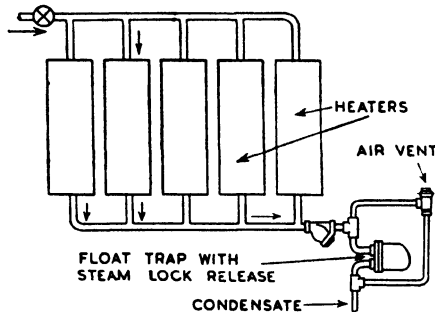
SINGLE HEADER HEATER BANK WITH STEAM LOCK RELEASE AND THERMOSTATIC BY-PASS
